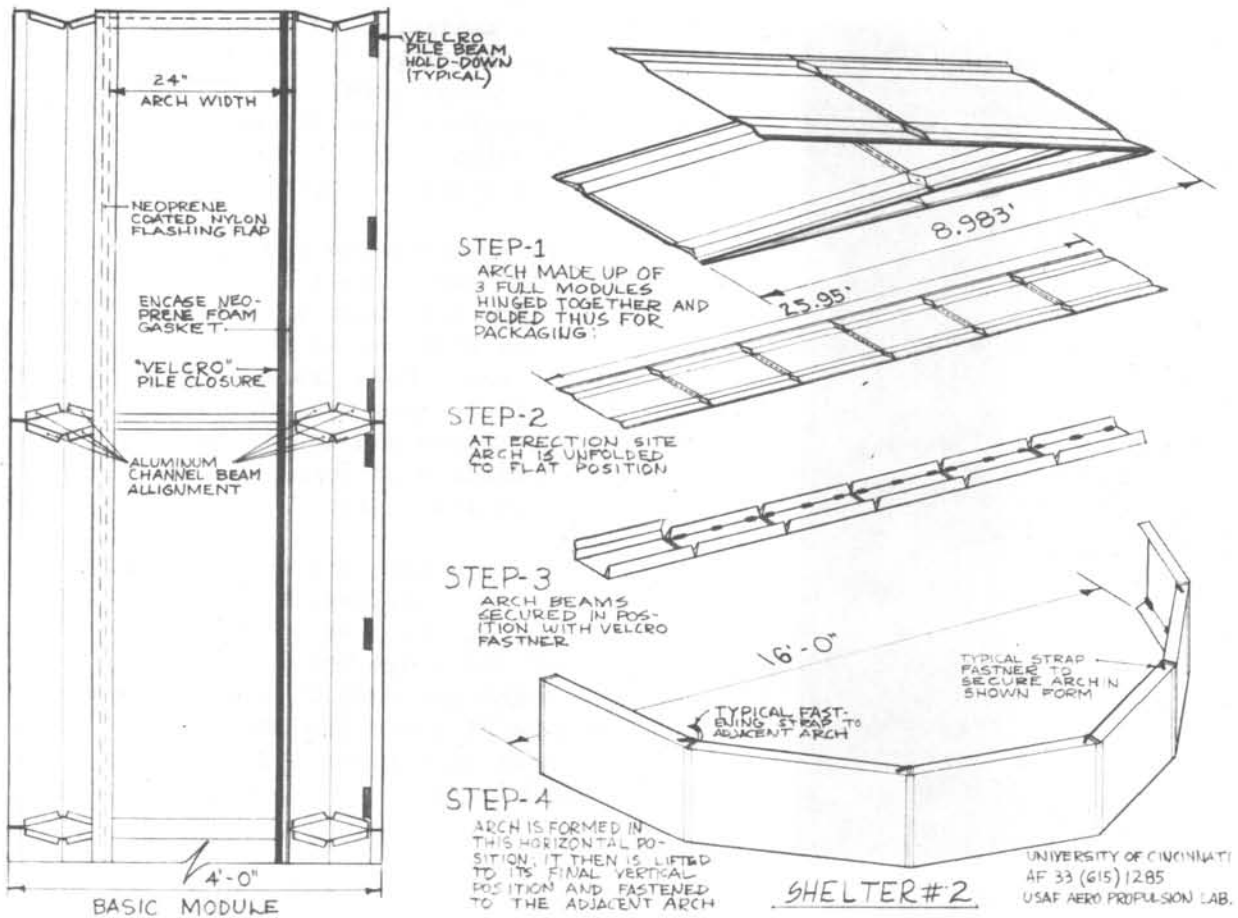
Drawing - Basic module and typical arch "folded beam" concept.
